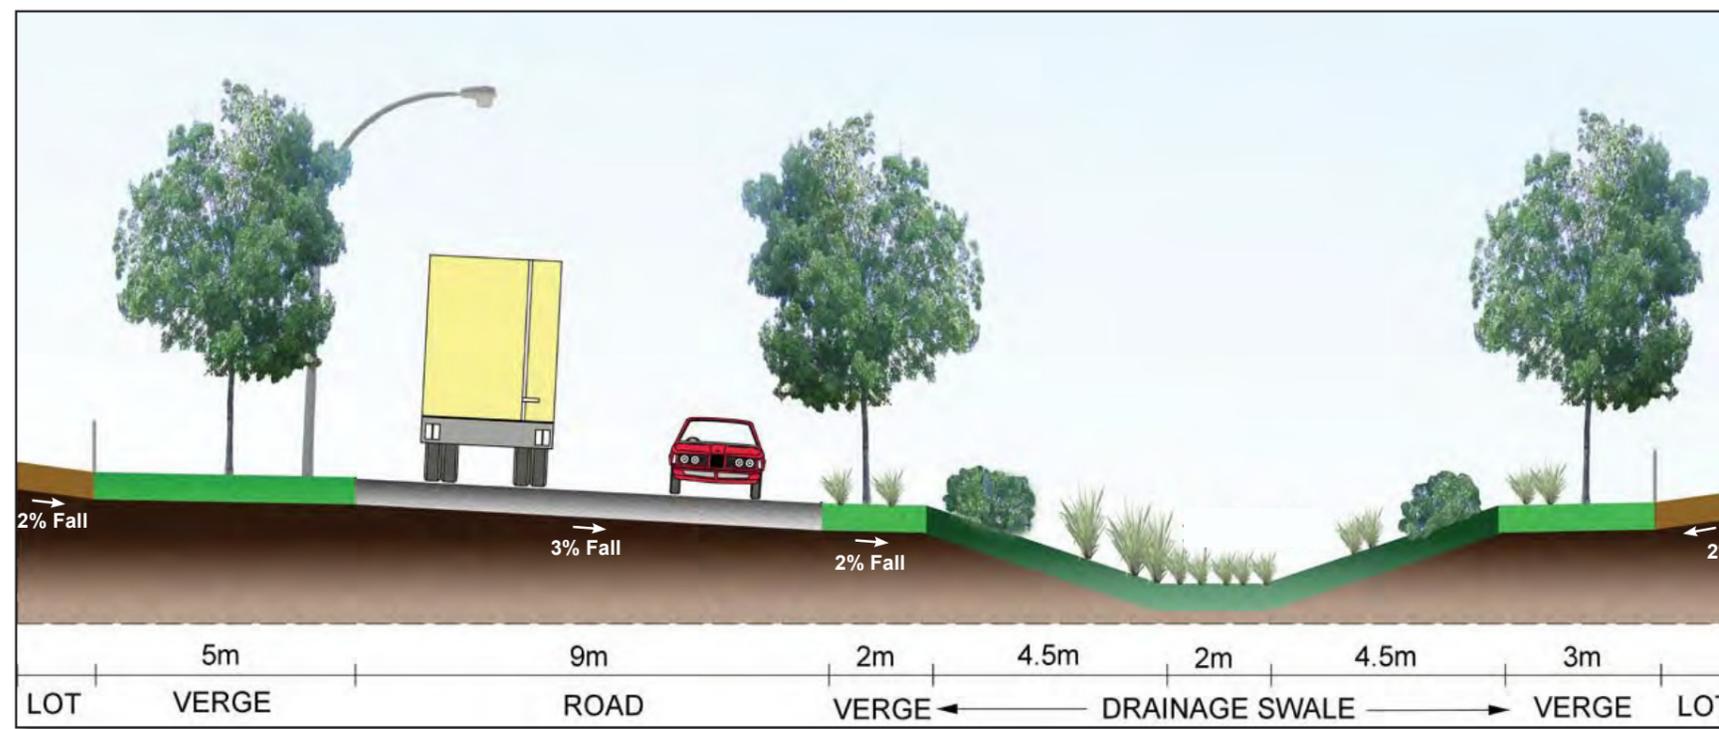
Concept Cross-Section for a Road and Swale Arrangement on Major Drainage Lines
